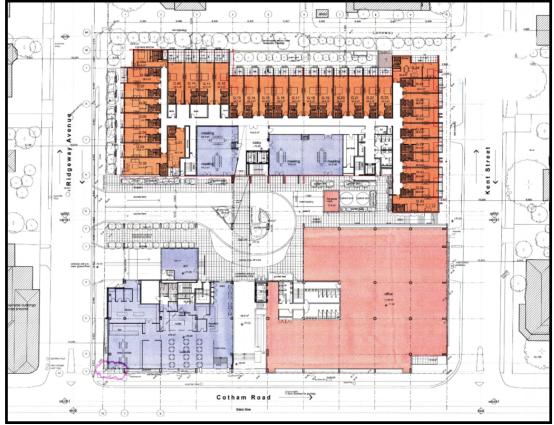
Endorsed Ground Floor Plan (Post13/00017 Endorsed on 30 January 2013)
